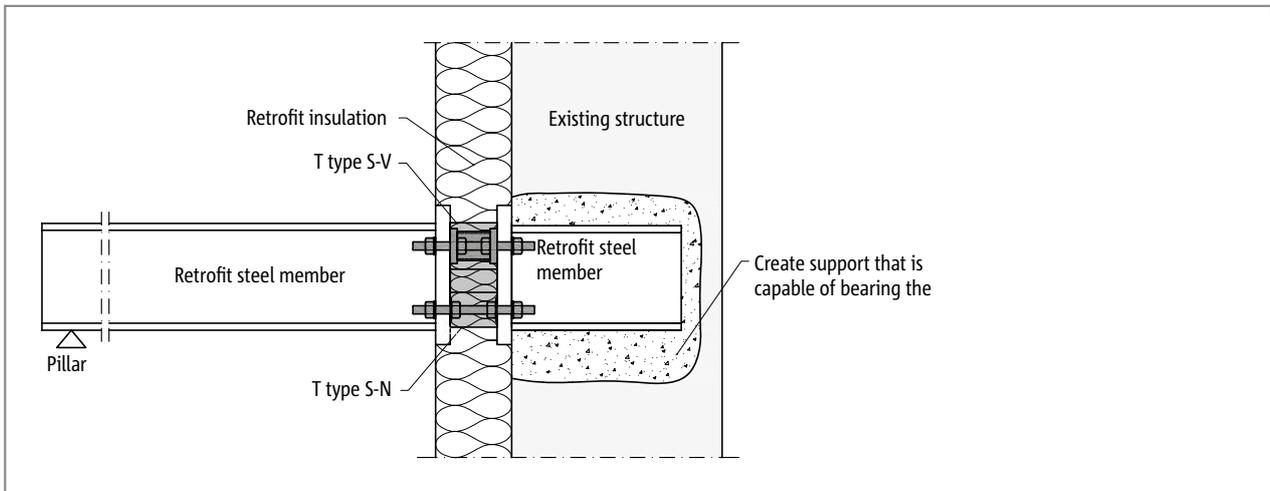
Schöck Isokorb® T type S-N and T type S-V: Retrofitted supported steel balcony; connected to retrofit wall support
